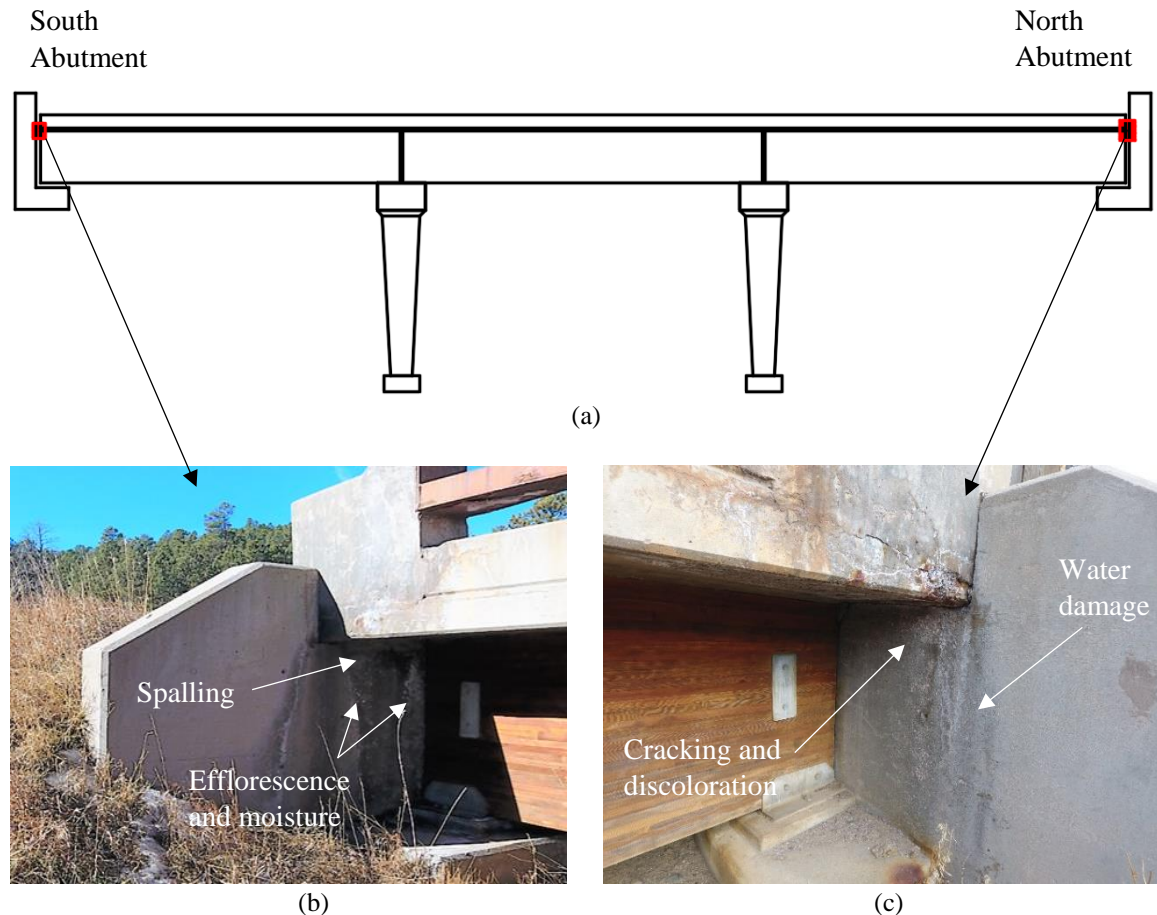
Sample damage on Abutment: (a) schematic of damage location on abutment; (b) damage on South Abutment near Girder 4 (taken by Luis Duque using drone); and (c) damage on North Abutment near Girder 4 (taken by Junwon Seo using drone).
